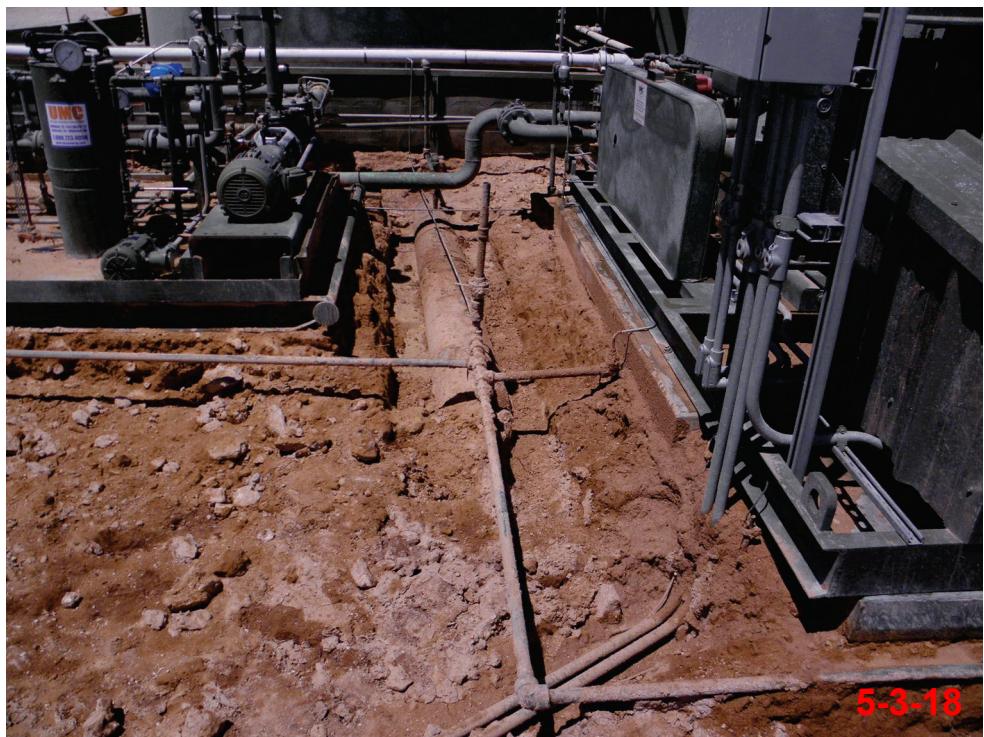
View of hydrovac activity around LACT Unit equipment facing north
